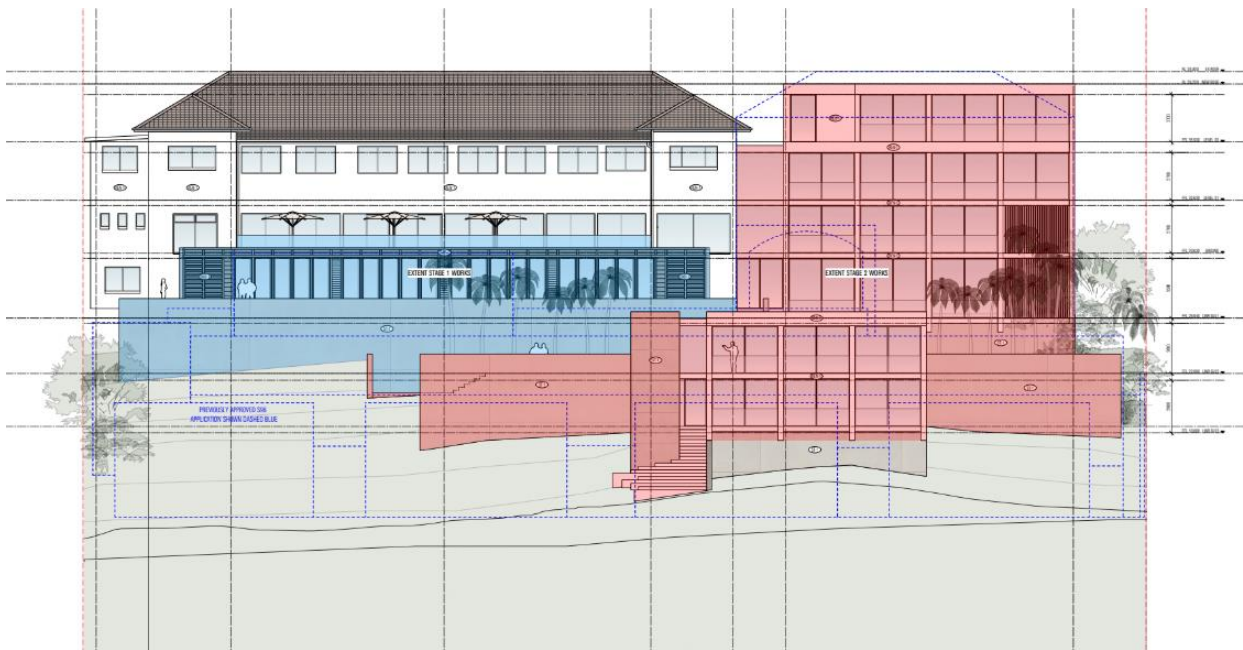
East elevation showing proposed Stage 1 (blue) and 2 (pink) works as well as extent of works approved in 2013 (blue dashed line).
